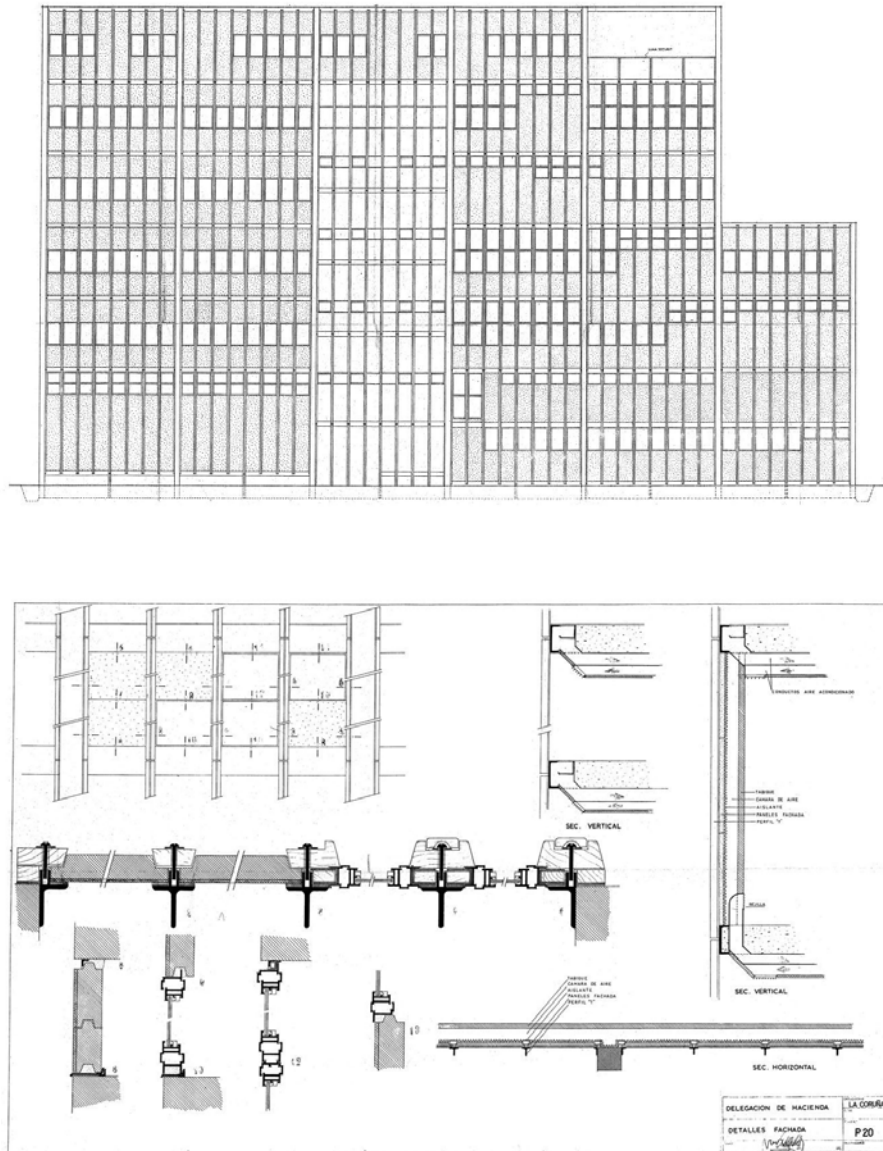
Elevation (above) and exterior panel construction detail, 1956. Finance Headquarters Building, La Coruña, 1956, by Alejandro de la Sota, Ramón Vazquez Molezún and Antonio Tenreiro.
